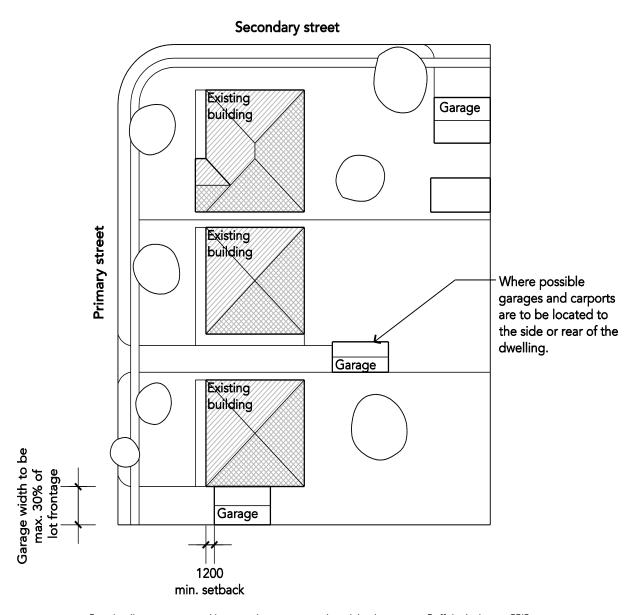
Site plan illustrating compatible garage locations in residential developments - Griffiths Architects 2012.
